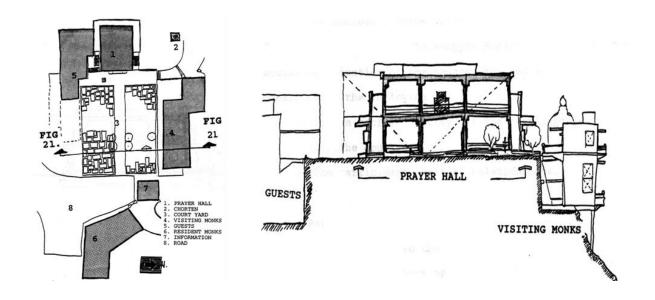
Plan of the Courtyard and the Surrounding Buildings
